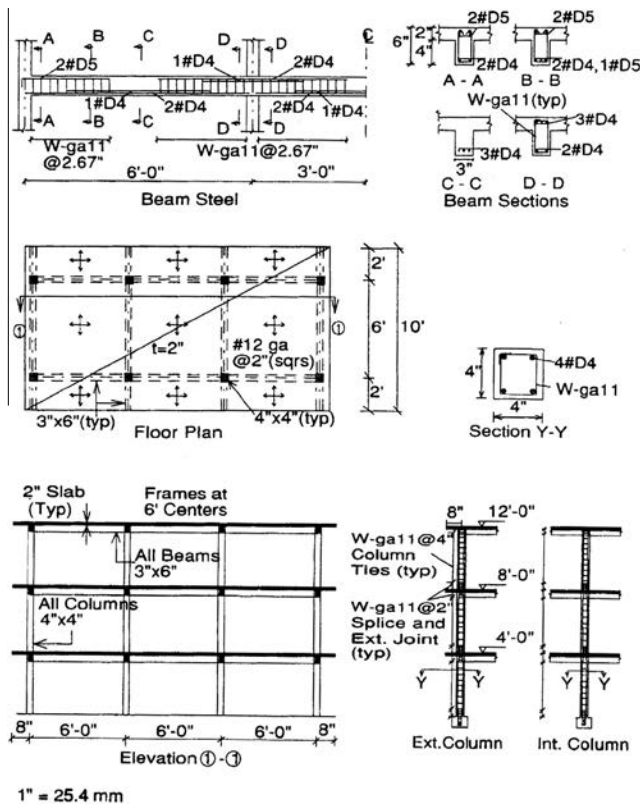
Dimensions and reinforcement arrangement of three storey frame [48].
